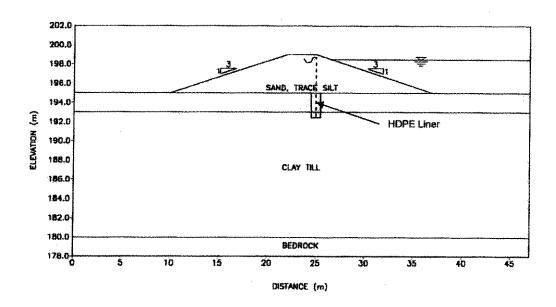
Proposed Layout of HDPE Liner (Option 2)
